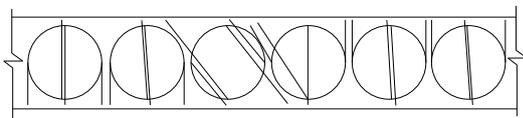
Connections of reinforced concrete slabs with a girder in precast-cast-in-place floor slabs with dual functional purpose of the principal reinforcement
